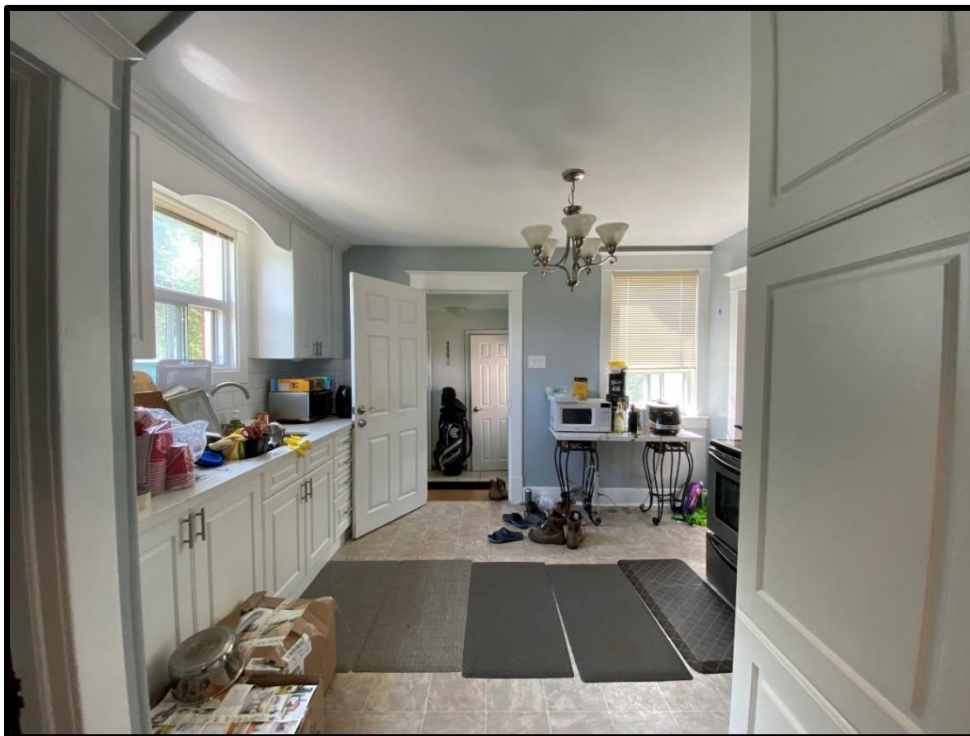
View of Kitchen/Entry from Front Hall to Rear Addition
